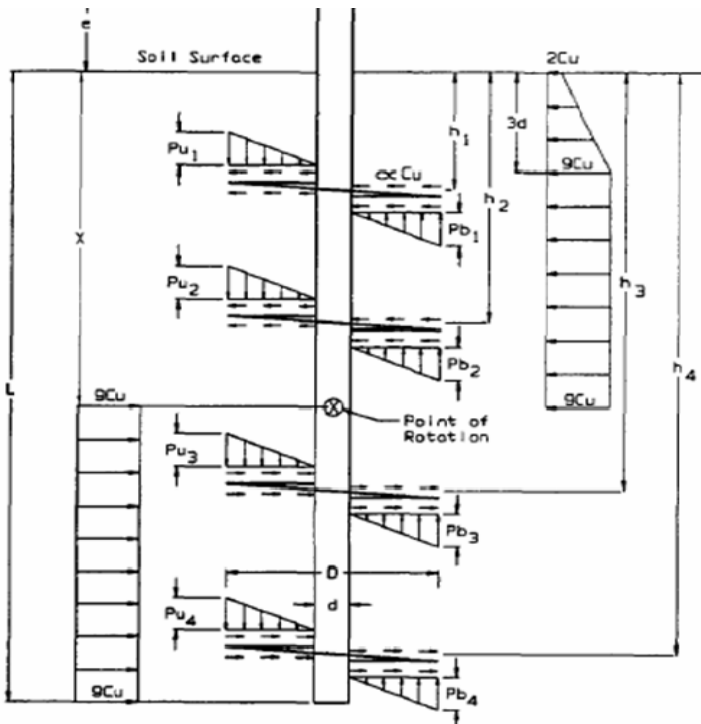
Helical Pile Anchor at Ultimate Lateral Load
